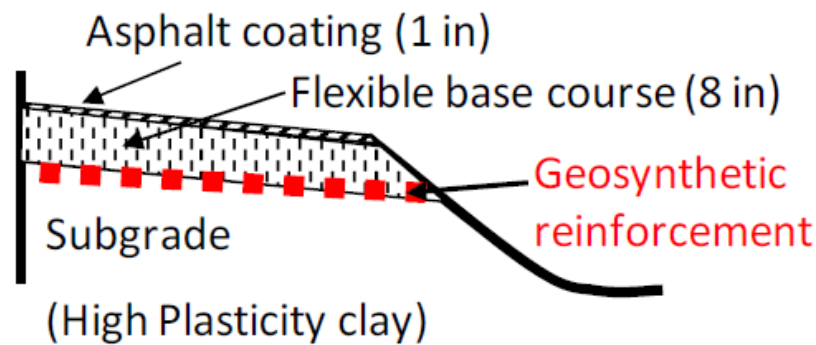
Cross-Section of a Road with Geogrid Reinforcement (Zornberg and Gupta 2009)
